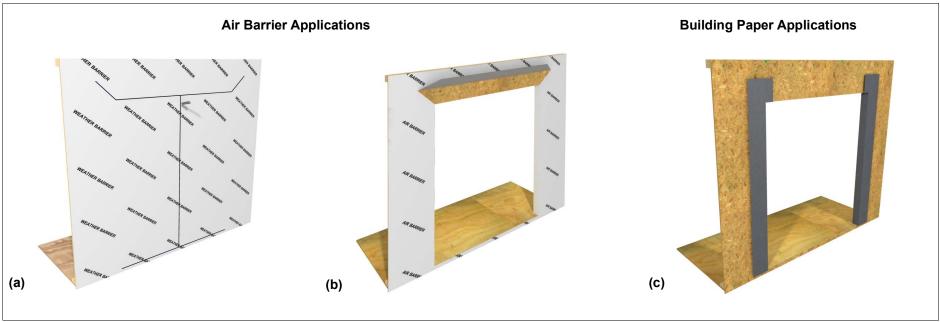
Rough Opening Preparation for construction methods using a continuous air barrier system or building paper.
